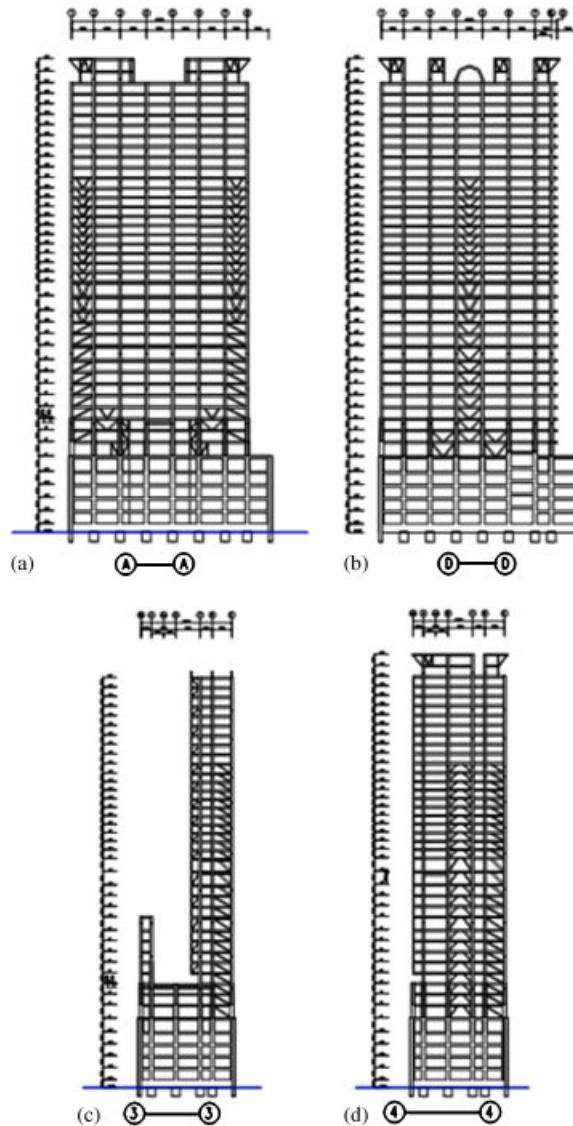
Elevations of the building: (a) Frame A; (b) Frame D; (c) Frame 3; and (d) Frame 4.
